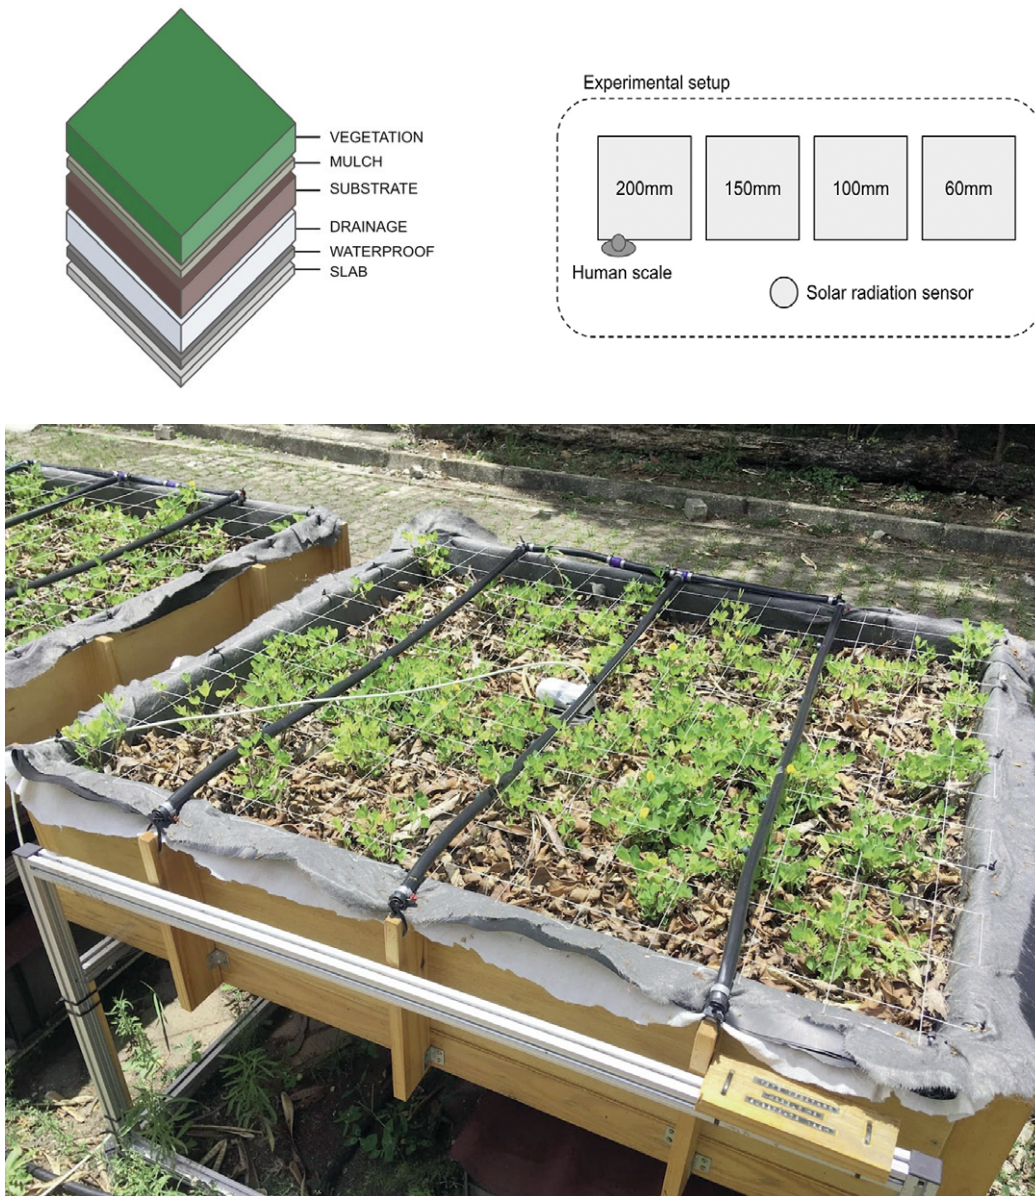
| Vegetated roofs have typical layers and slab structure support (credit: the Authors).
